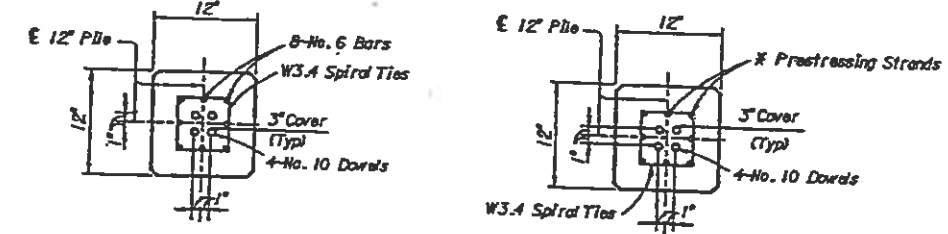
DETAILS FOR REINFORCED PRECAST & PRESTRESSED PRECAST PILE SPLICES
